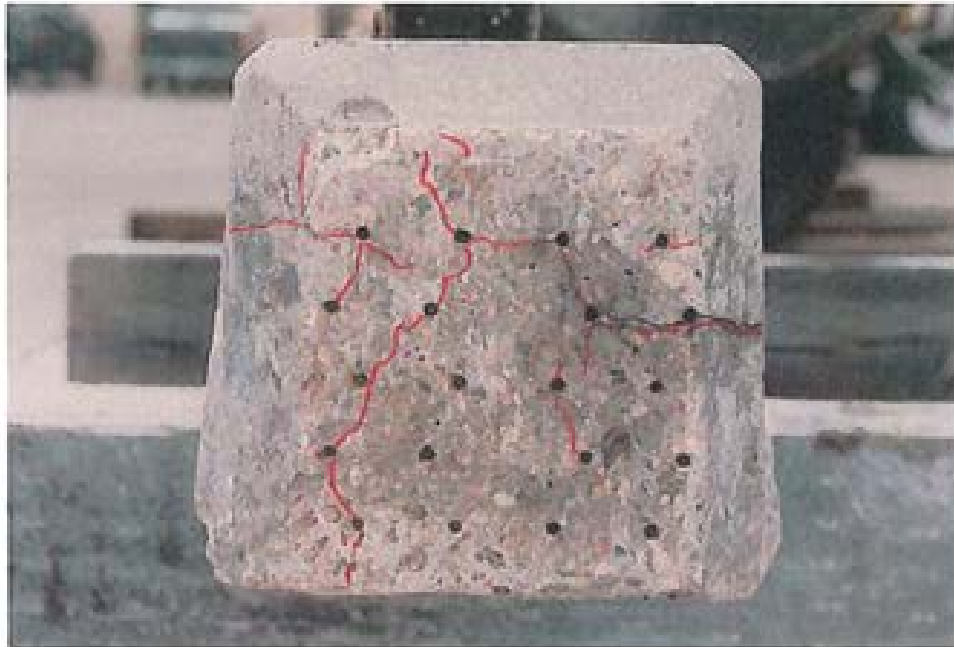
South end of tie NDT #1 with cracks outlined in red. L3472 102312 74
